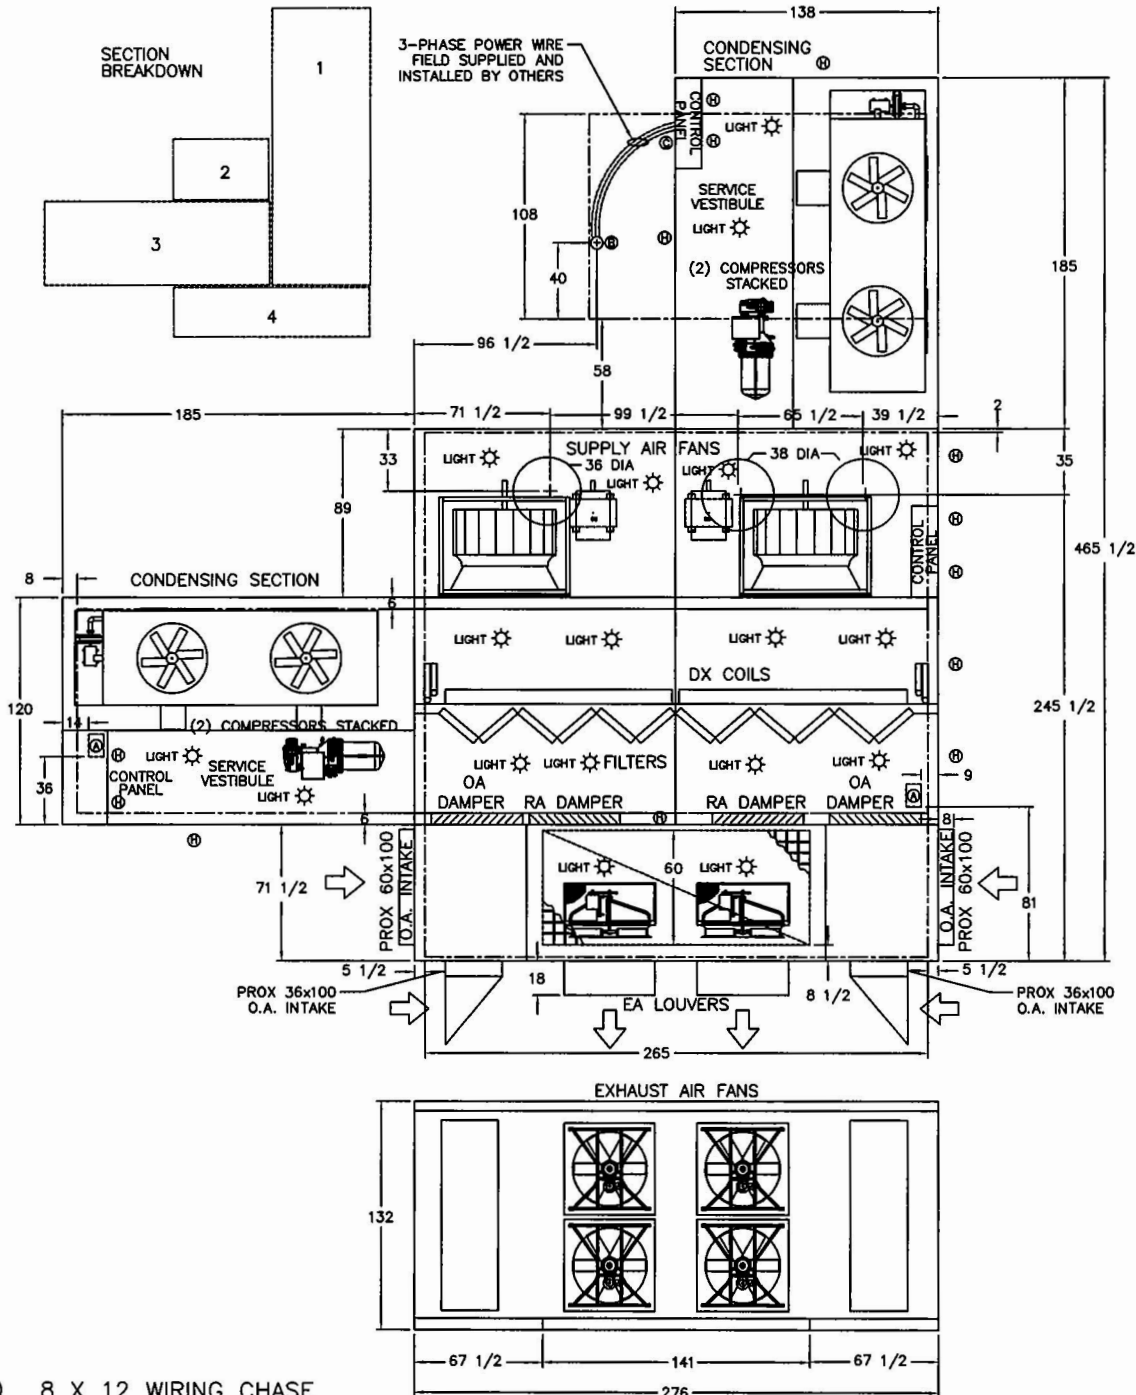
DETAILS OMITTED FOR CLARITY, DIMENSIONS ARE IN INCHES DRAWING NOT TO SCALE/ FO A361 SHV 02/04/09
